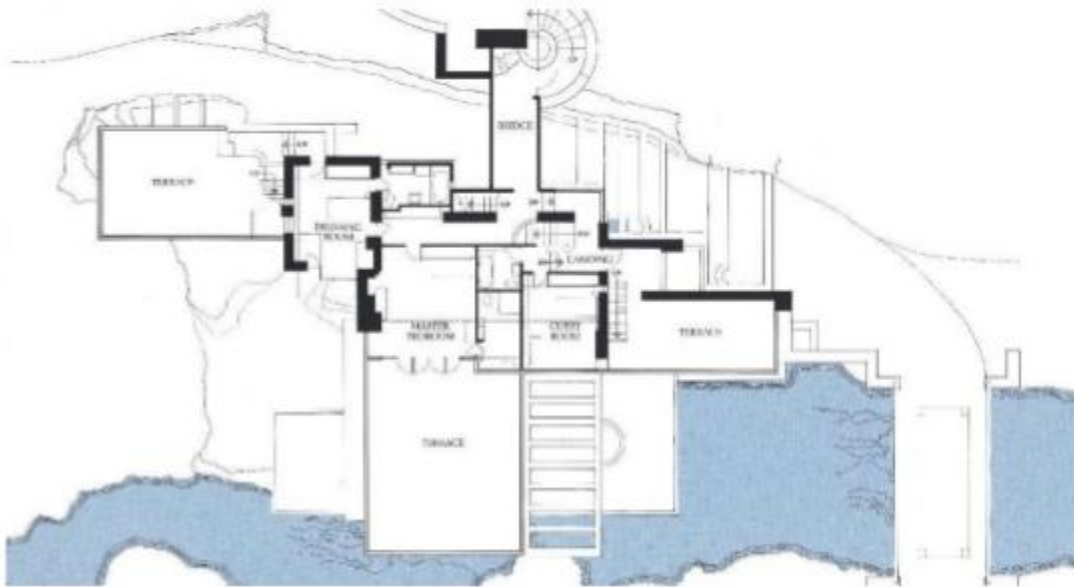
Falling Waters Floor plan by Frank Lloyd Wright
